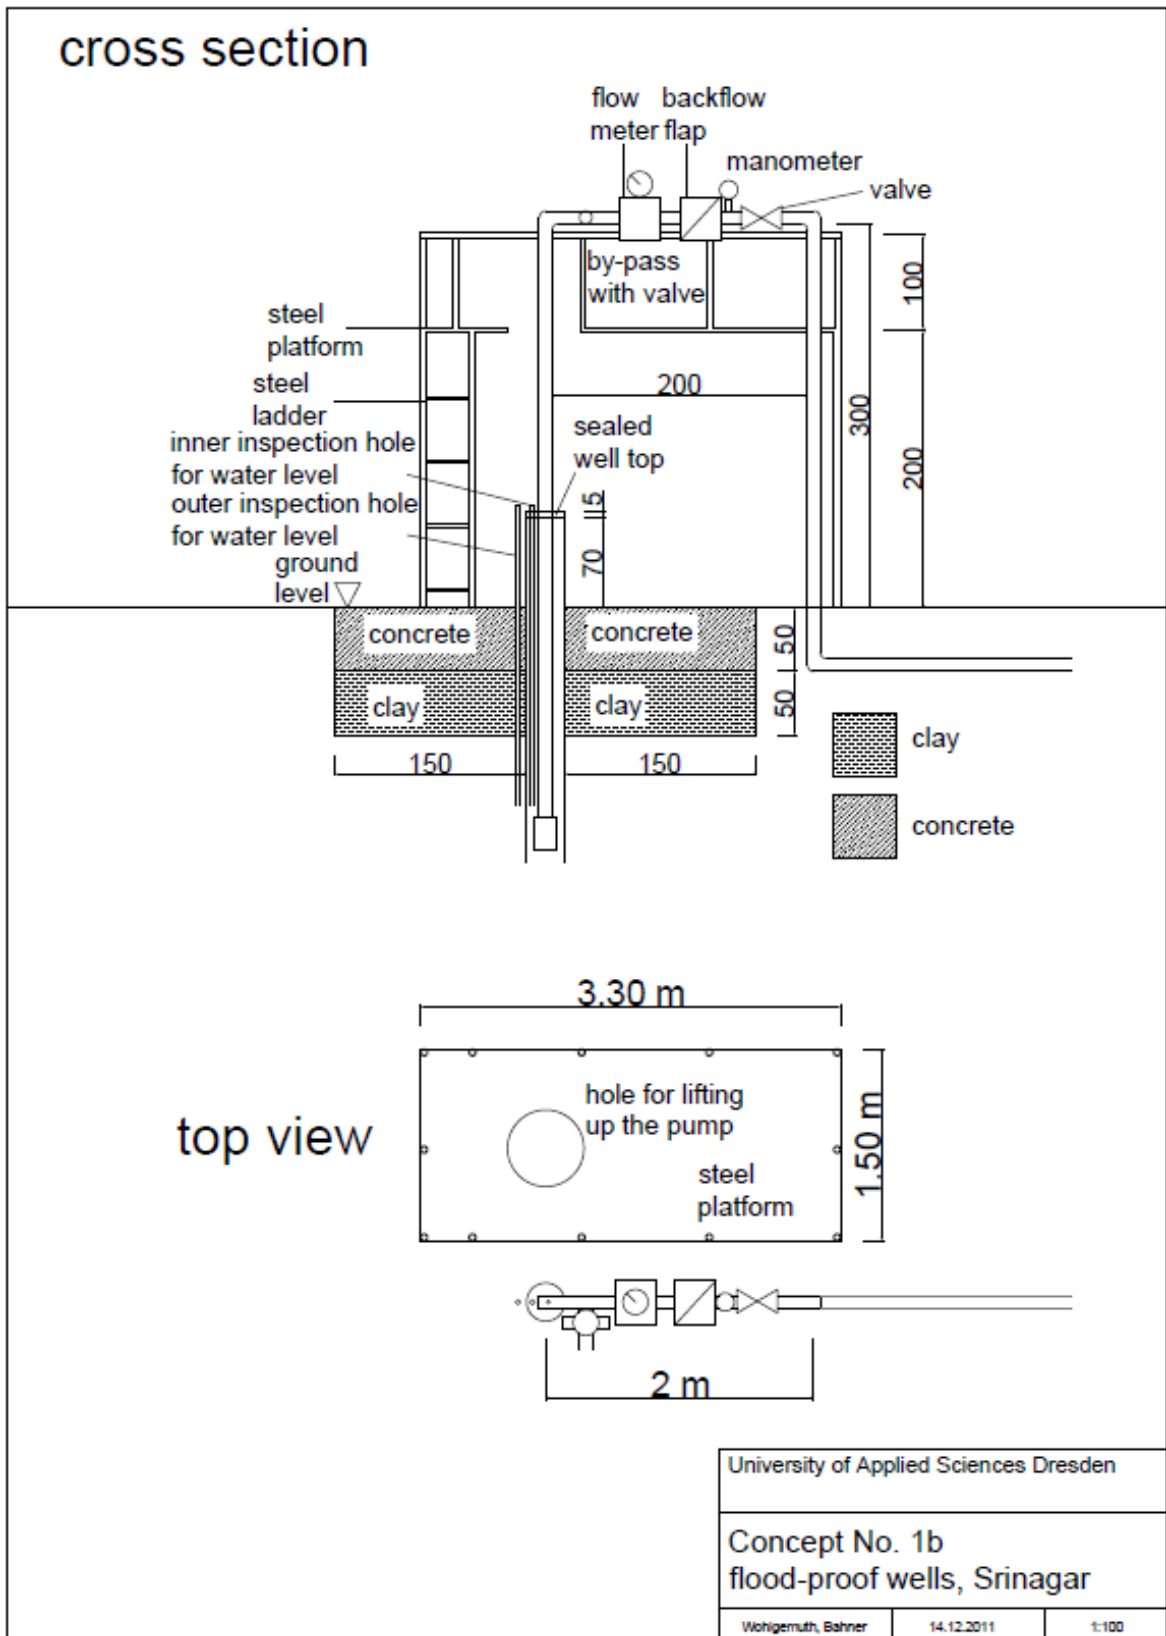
Design 2 – Elevated platform (Saph Pani, 2013)
